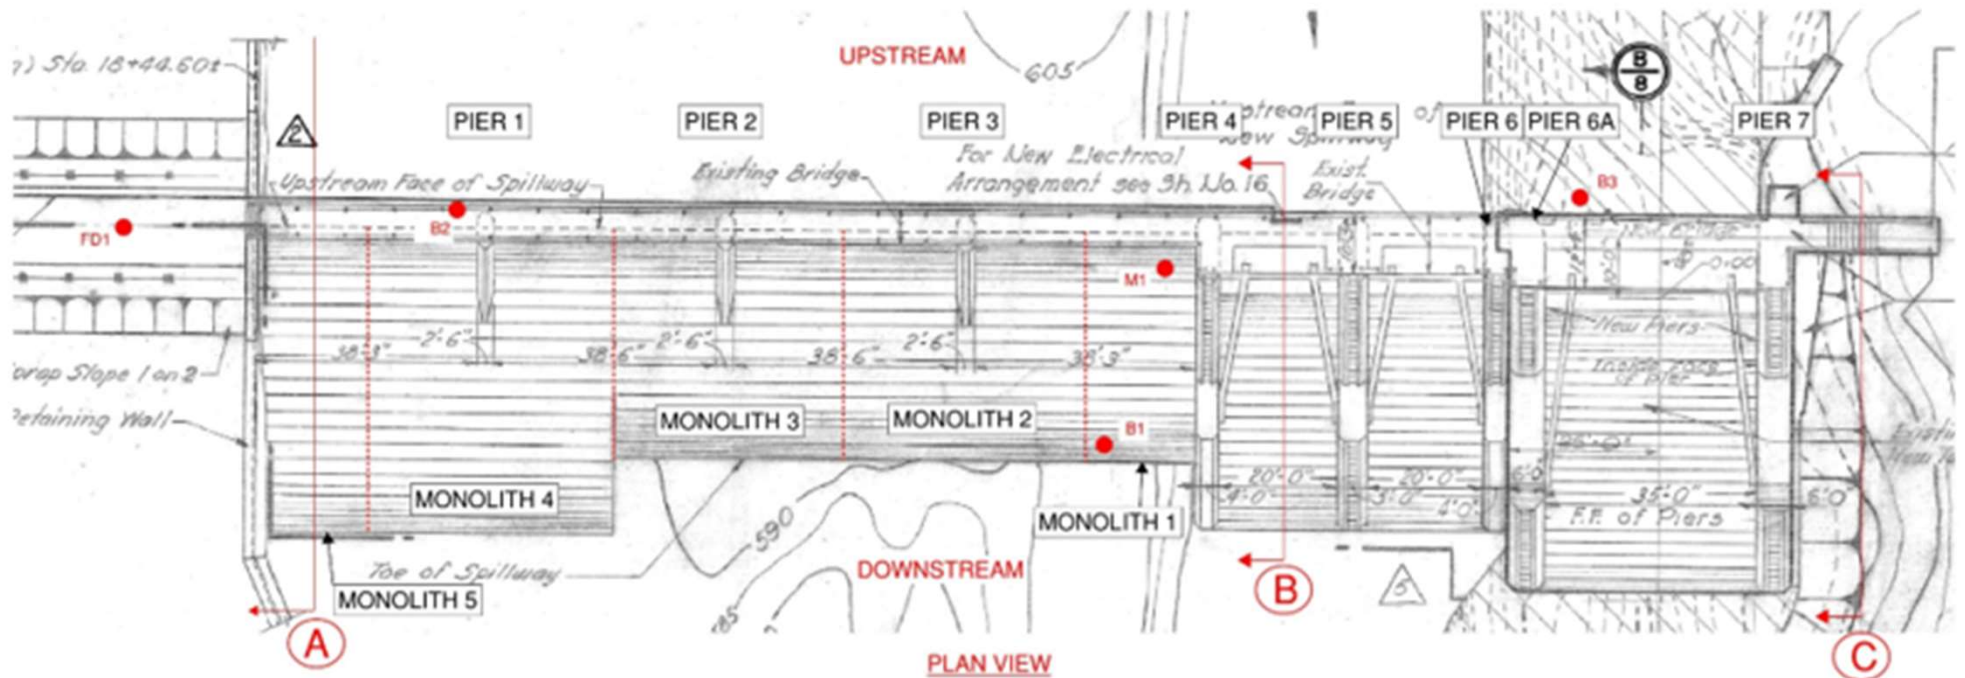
Plan View Showing Bedrock Core and Embankment Boring Locations
